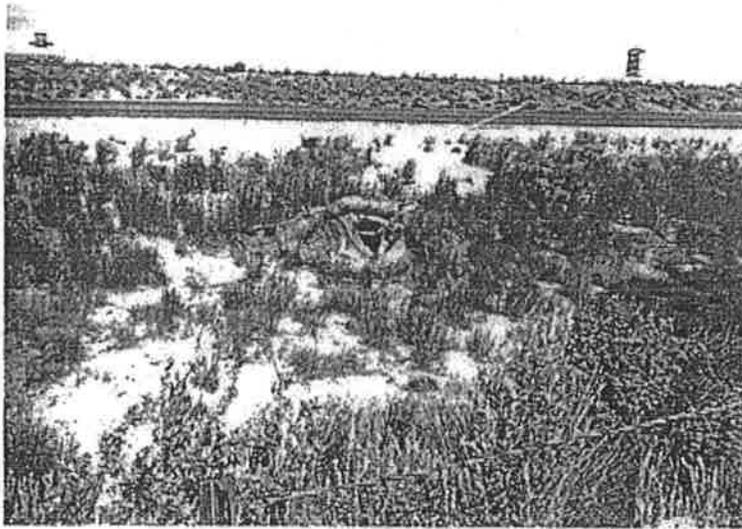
View of the south I-15 culvert located near the southwest corner of the property, looking west.
